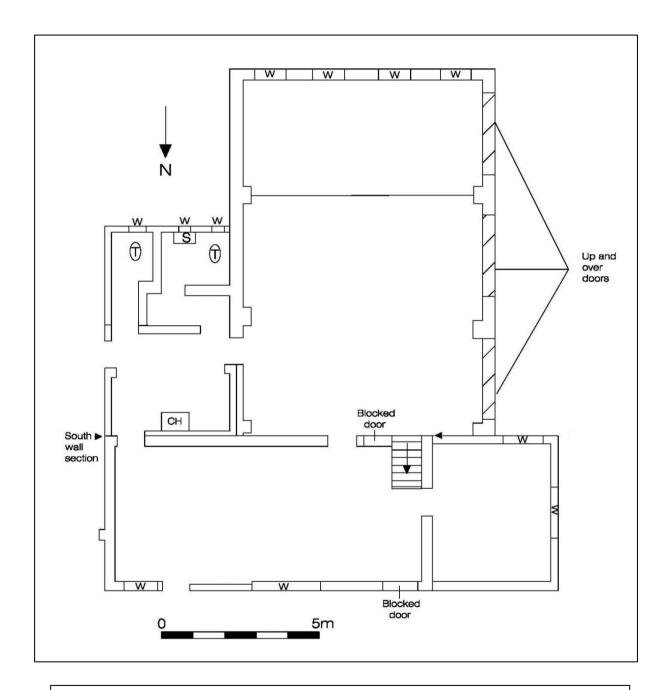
Crown View, Horsted Keynes: Ground floor plan of Crown Garage Building
